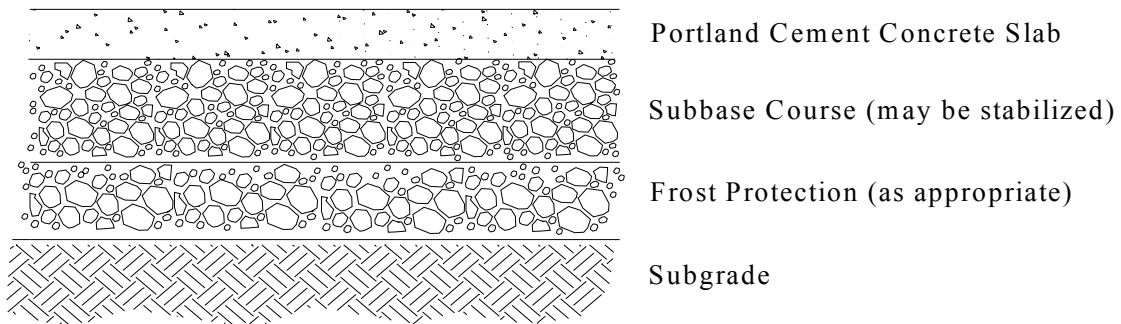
TYPICAL RIGID PAVEMENT STRUCTURE.
